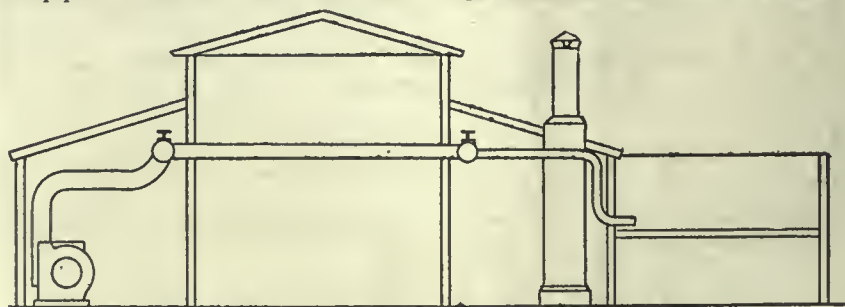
CROSS SECTION OF PIPING ARRANGEMENT FOR MACHINE SHOP.
